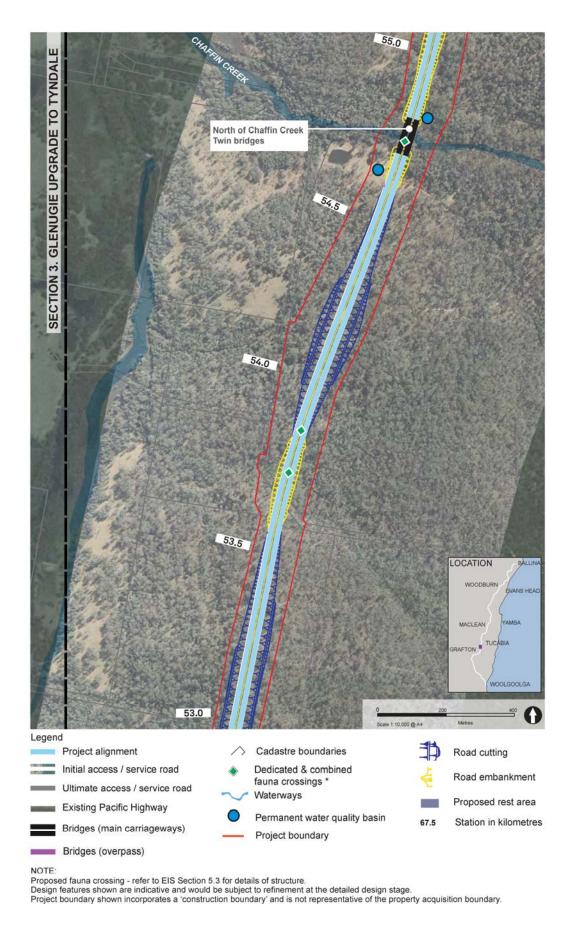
The project - Section 3 (Station 53.0 to 55.0)
